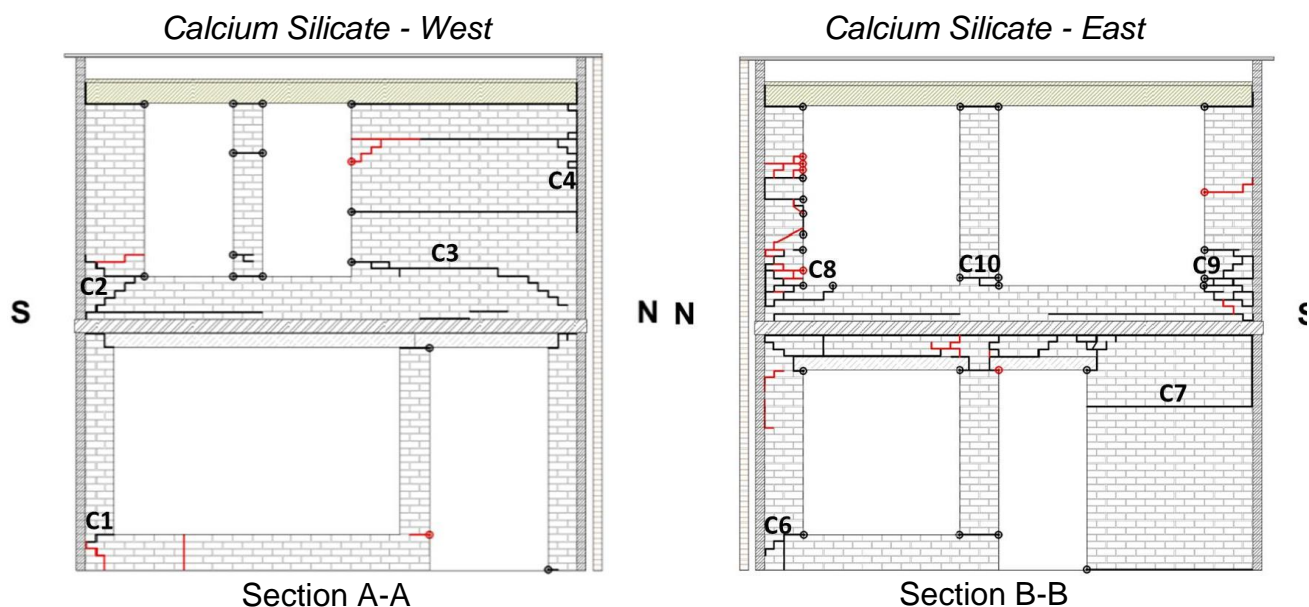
EQ-NPR IS 133% cracks - Calcium silicate longitudinal walls.
